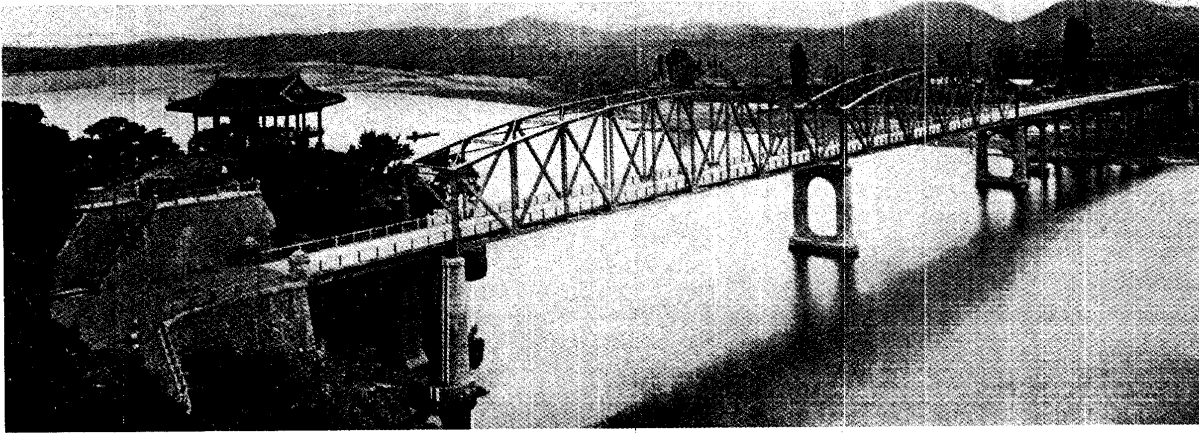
Bridge over Nam-gang, northeast of Chinju (Shinsbū).
